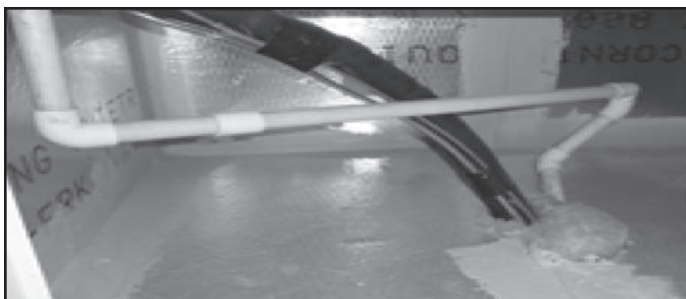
Framed Return Plenum retrofitted with ducted return air path formed by duct board sealed on the air barrier (foil) side. Note sealant at floor penetration. Photo courtesy Janet McIlvaine and the Building America Partnership for Improved Residential Construction.
